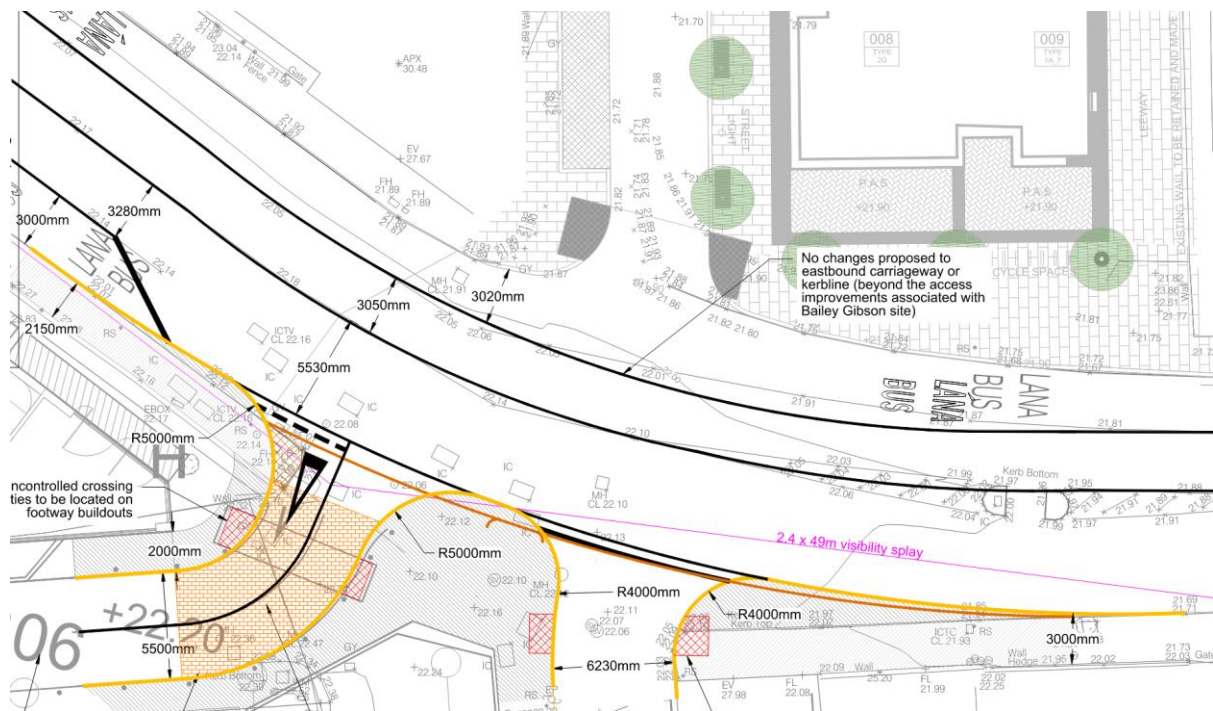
Proposed site entrance improvement works off South Circular Road (Reference: Systra)
